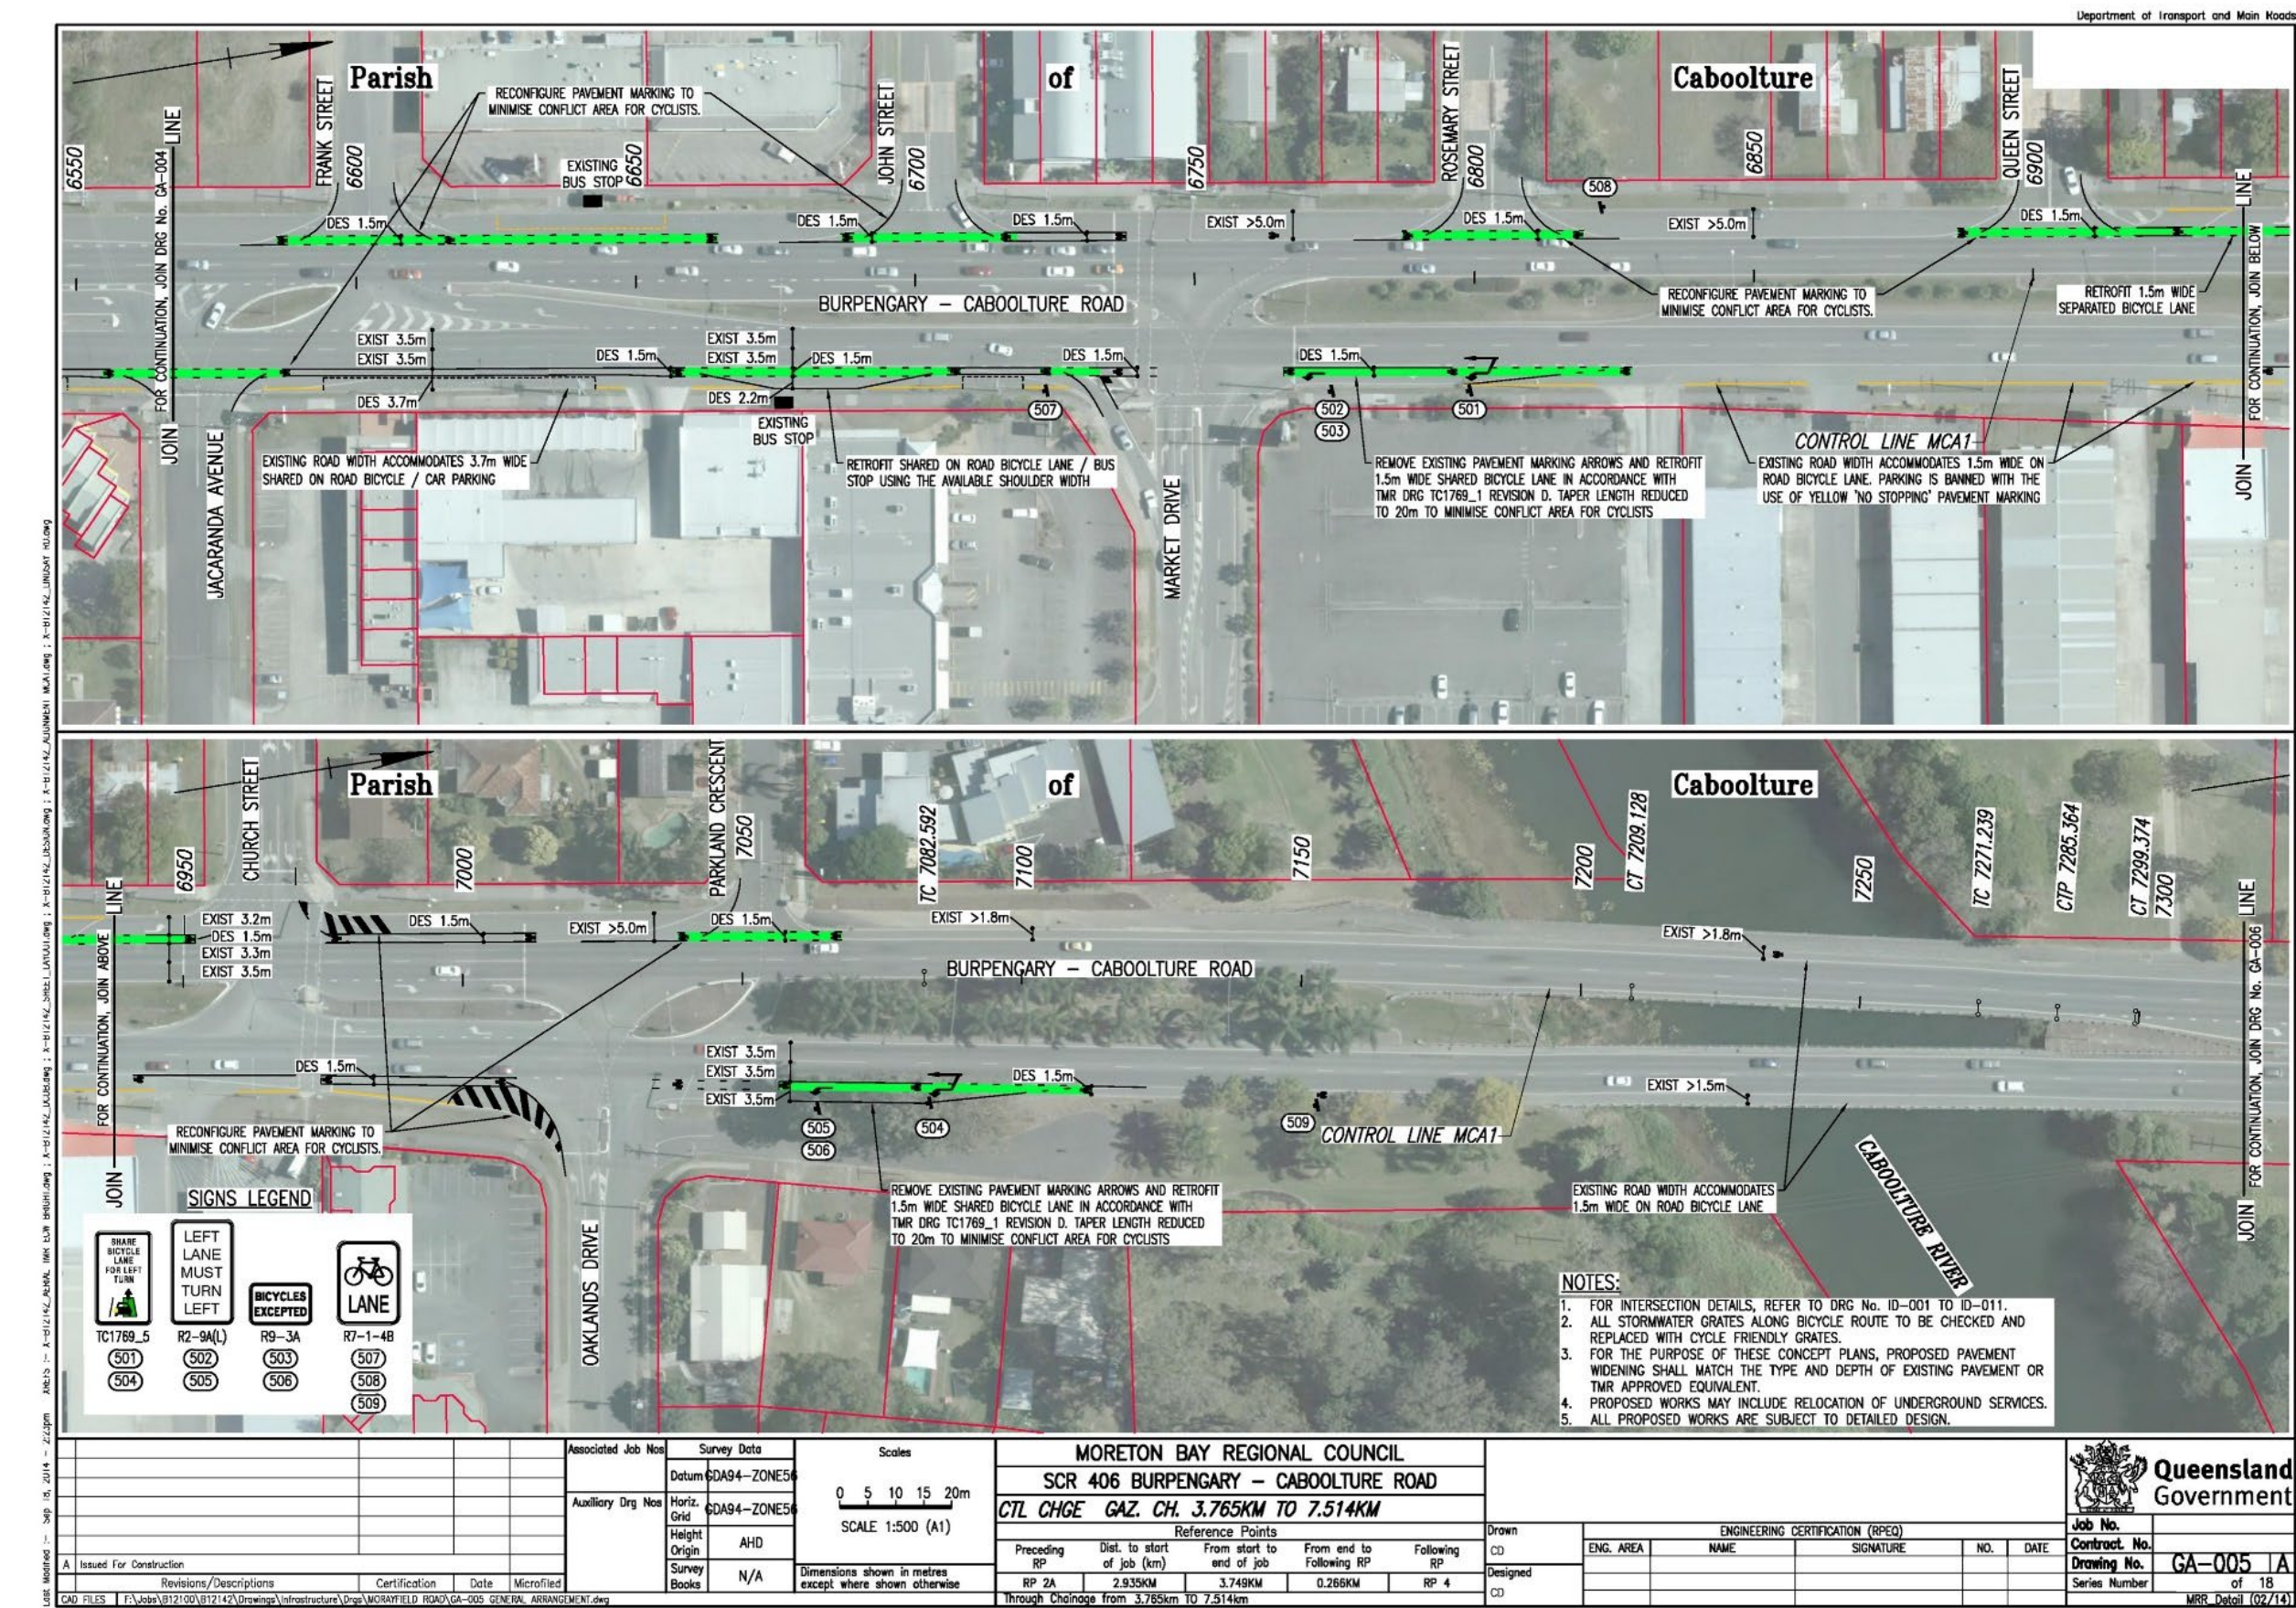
(f) – Cycle lane facilities layout – generic example sheet 2 of 2
